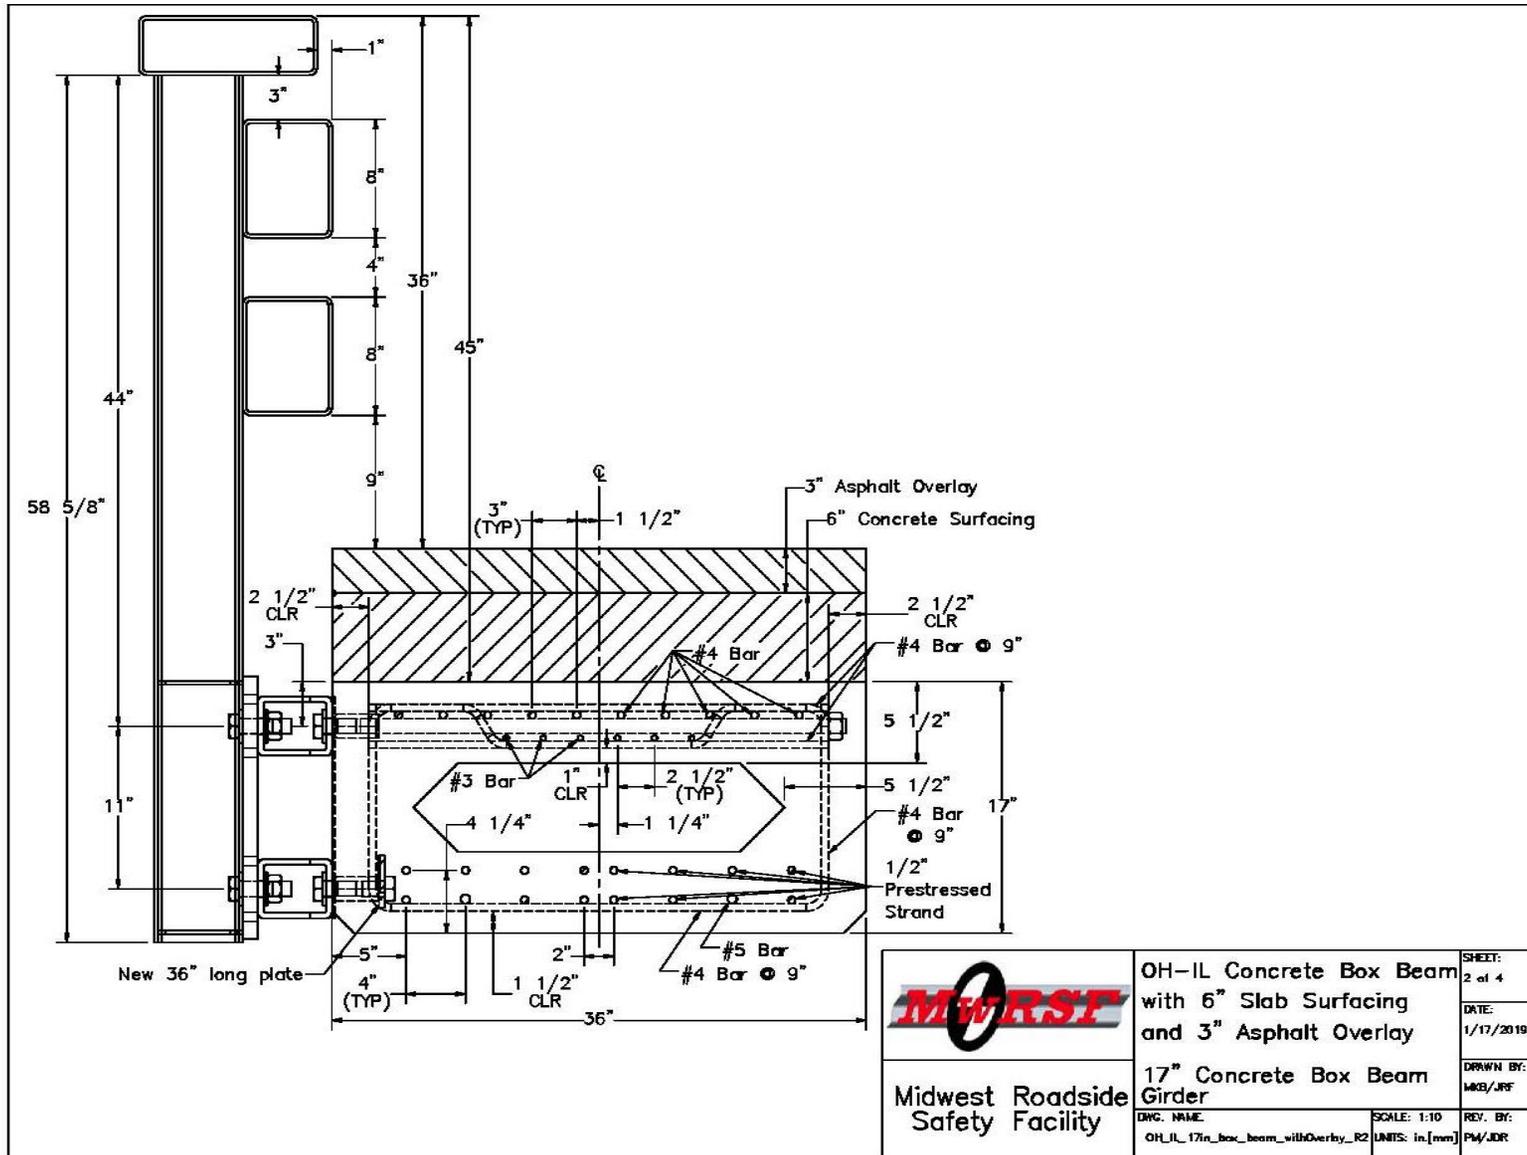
Typical 17-in. (432-mm) Deep Concrete Box-Beam Girder with Concrete Wearing Surface and Future Overlay
